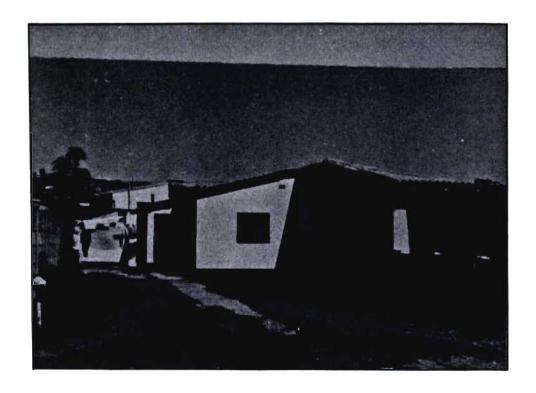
A municipally built dwelling, two roomed (unimproved)
